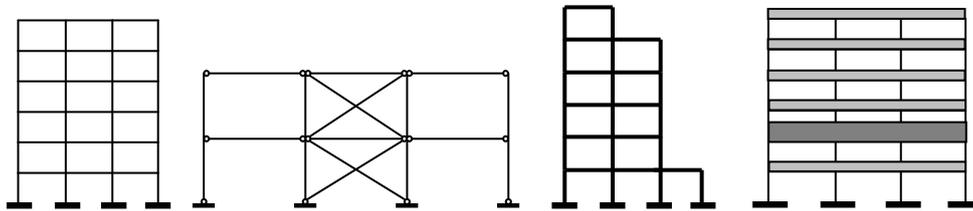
Types of planar steel building frames considered in the HFD seismic design method
